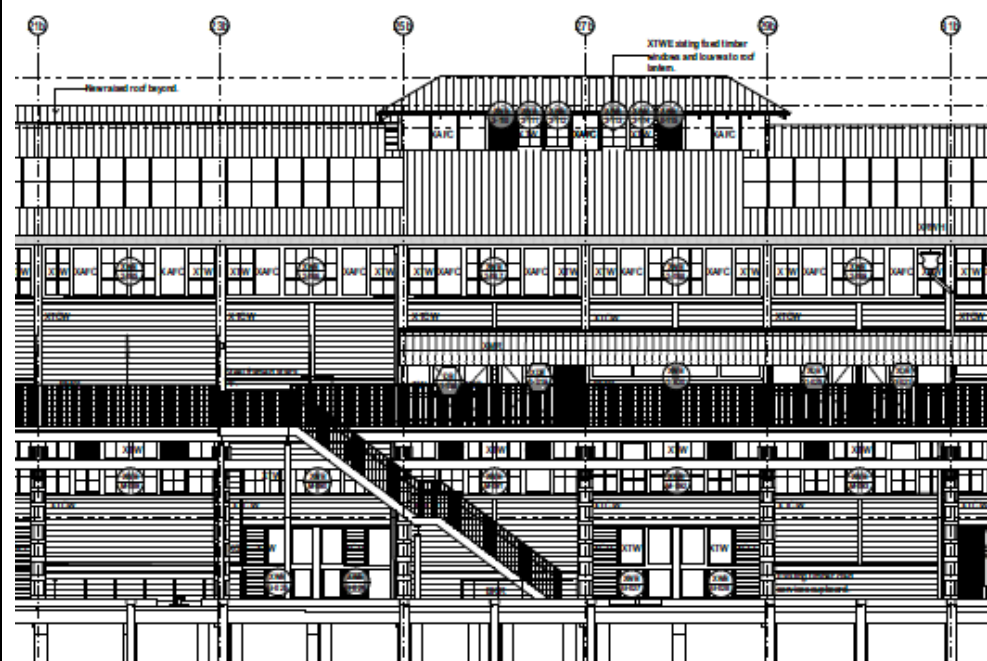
approved eastern façade (Plan A-222, 07/07/20)
